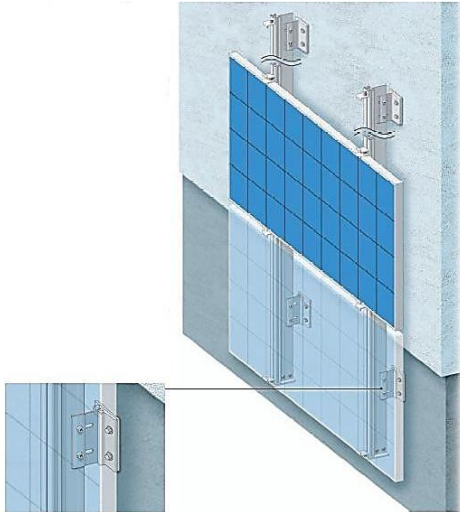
Detail of clamp point fixing on façade (Schüco company, 2011).
